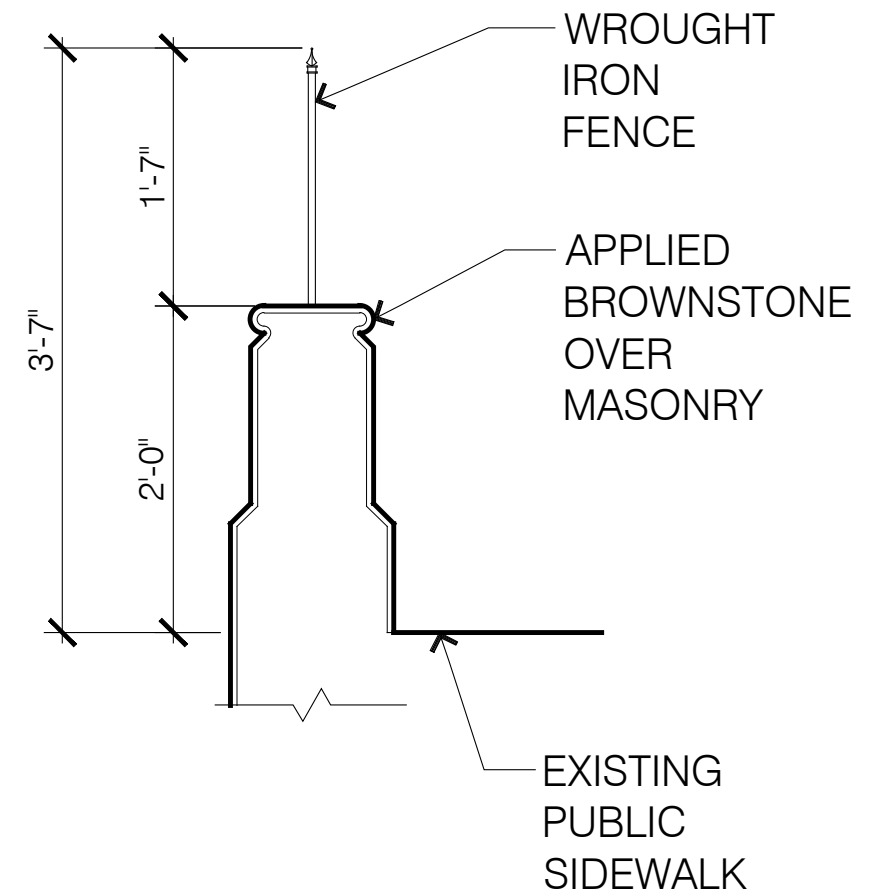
DETAILS OF POST AND RAILING TO MATCH THAT OF 160 WEST 88TH ST
